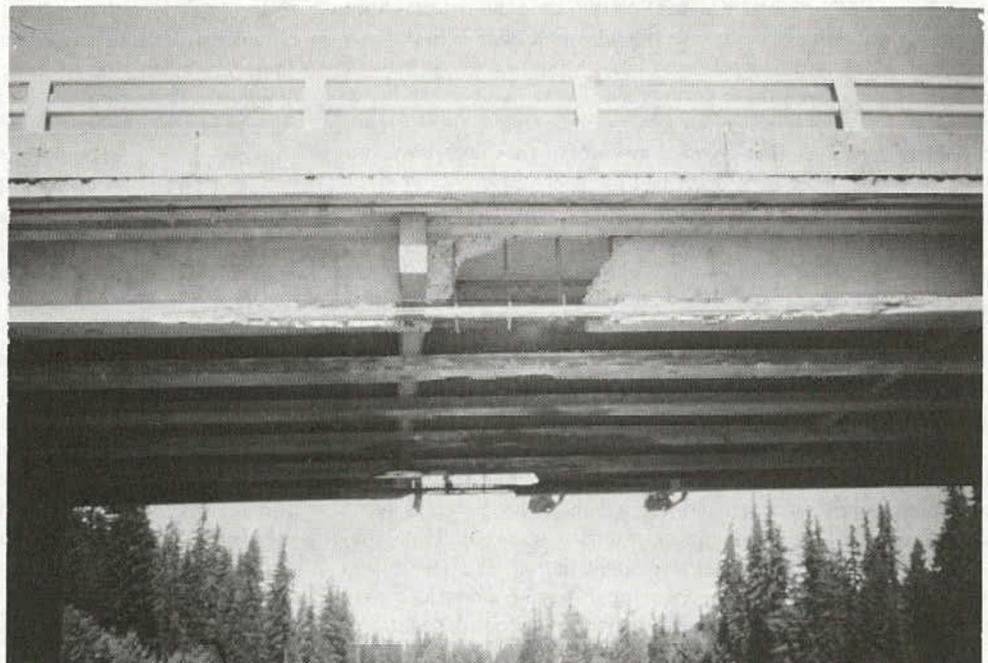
Major concrete damage with no apparent strand damage. (Courtesy of State of Washington DOT)
